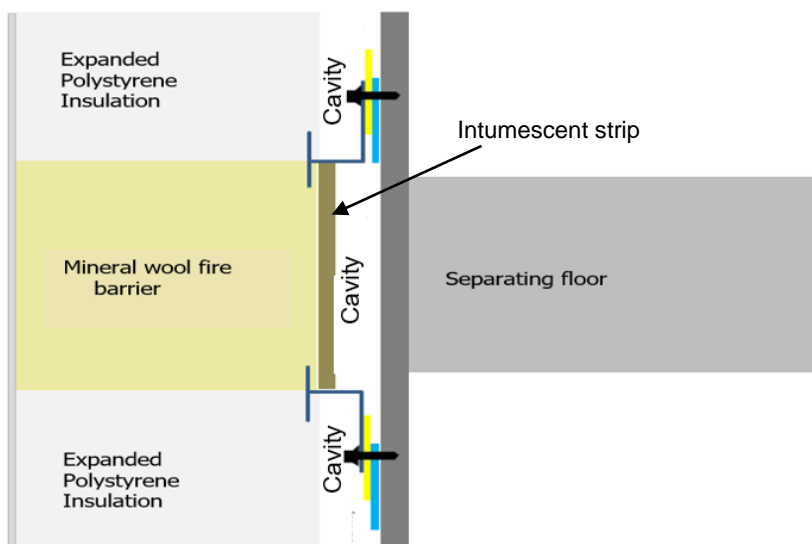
Section through separating floor in an External Wall Insulation (EWI) system
